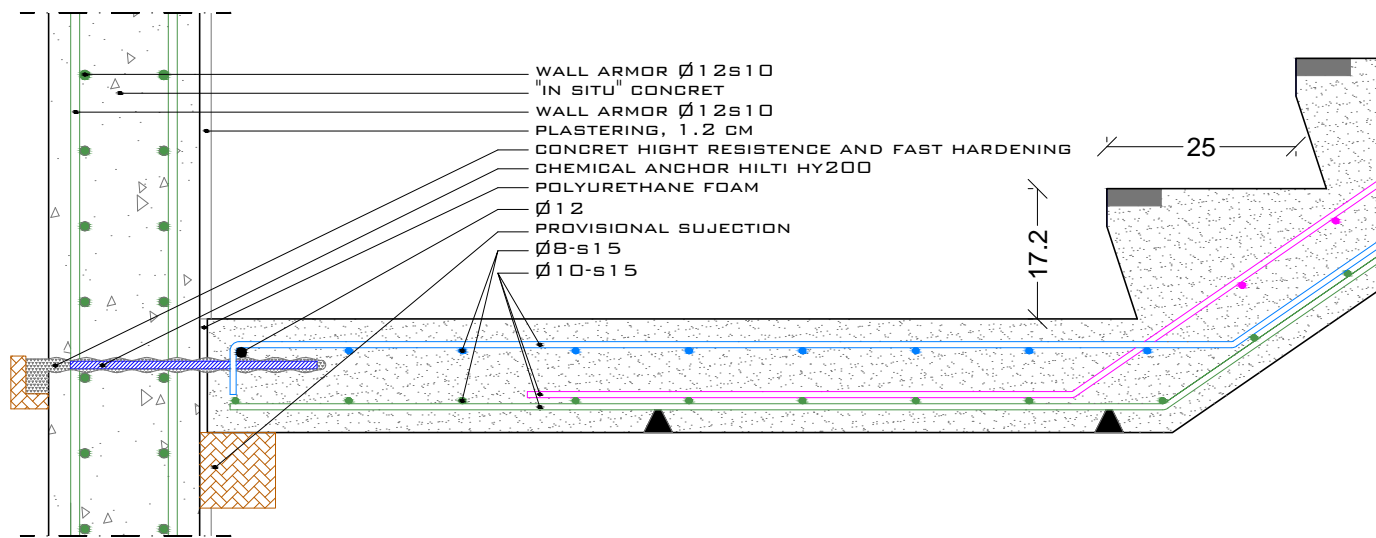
UNION PREFABRICATED STAIR-IN SITU FLOOR \_S:1/10
